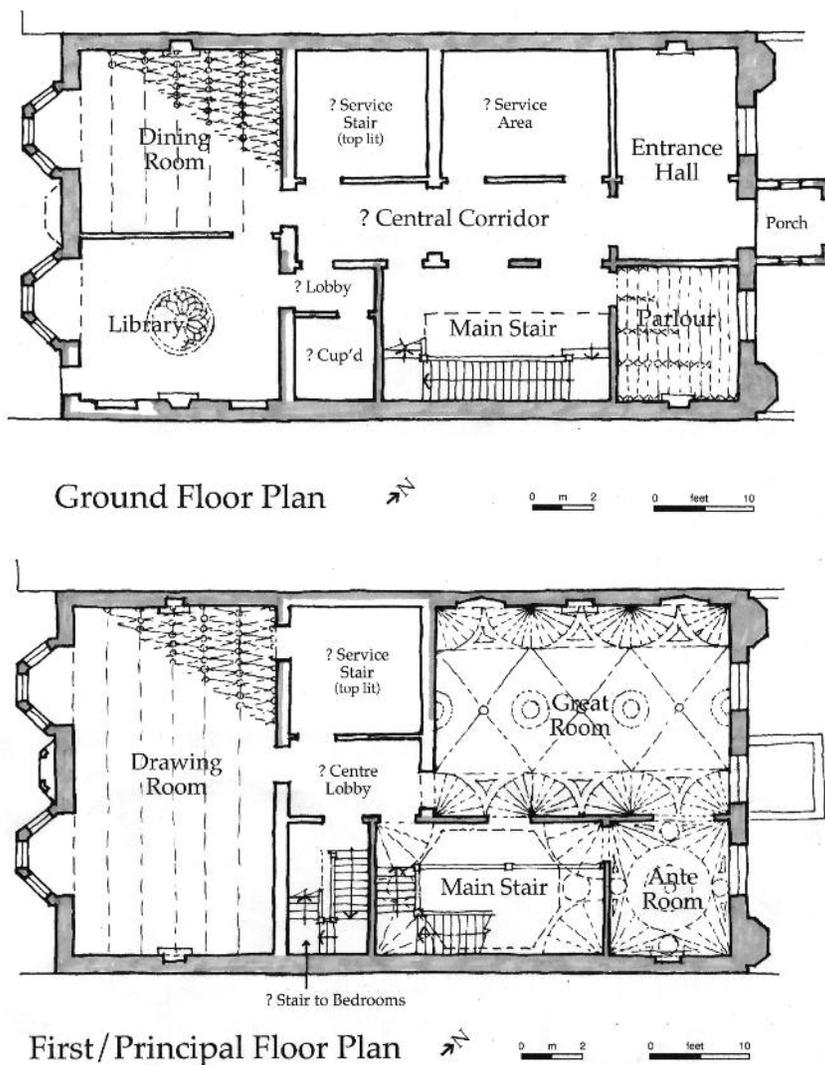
Pomfret Castle: conjectural ground and first floor plans, as built. (© drawing by Will Hawkes, 2012)
